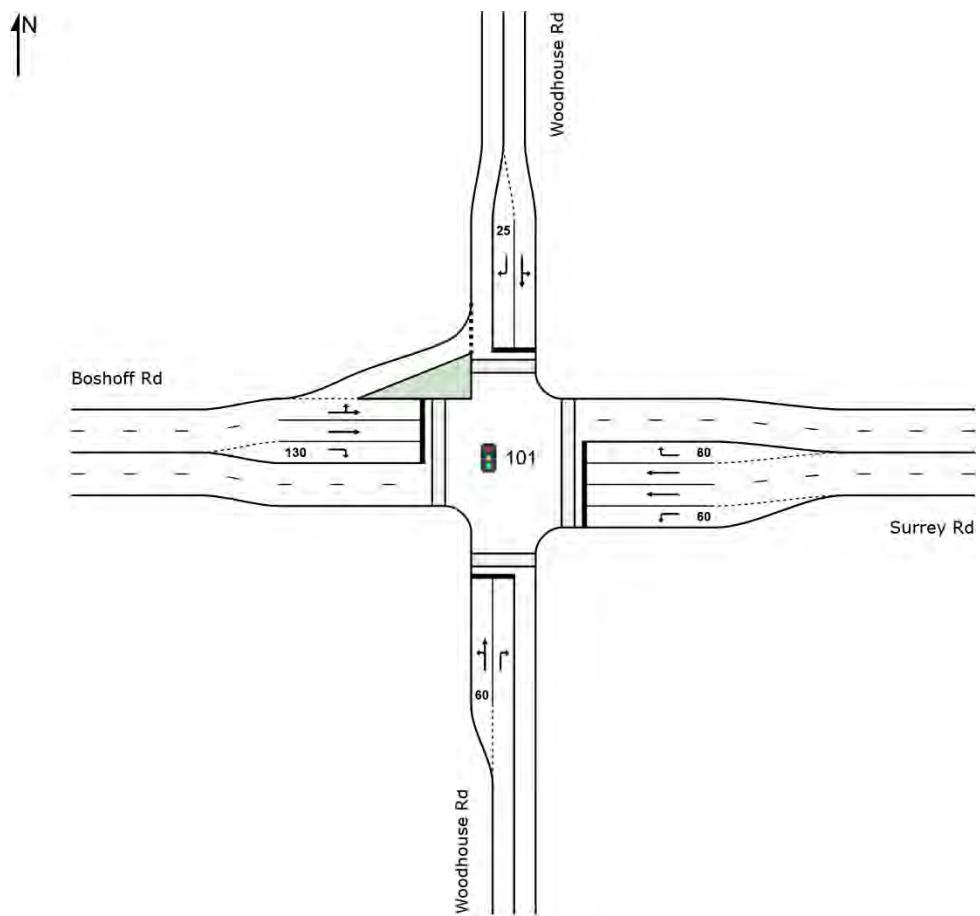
Existing Intersection Configuration for the Woodhouse Road & surrey Road & Boshoff Street Intersection
